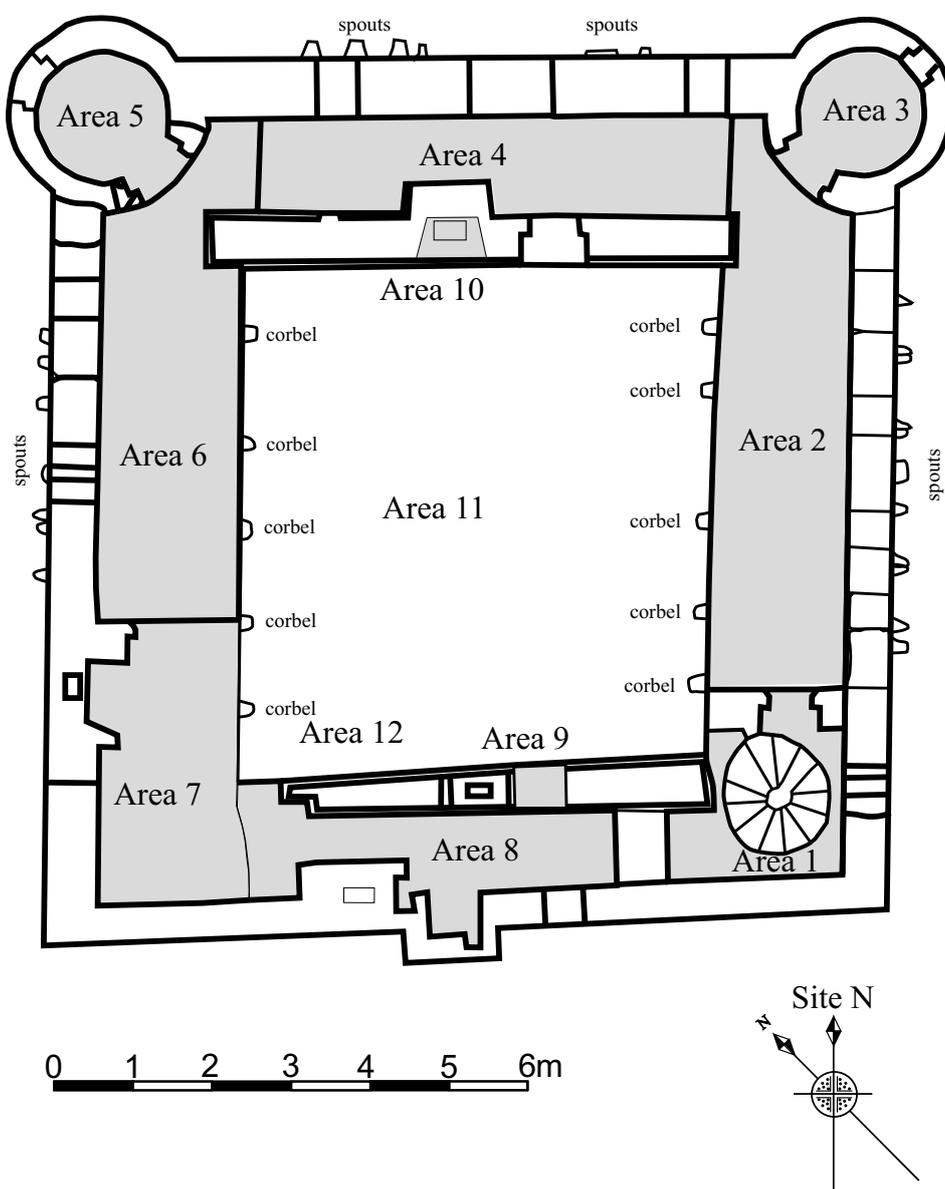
Areas investigated at Moy Castle. Plan after Martin Hadlington, Architect
